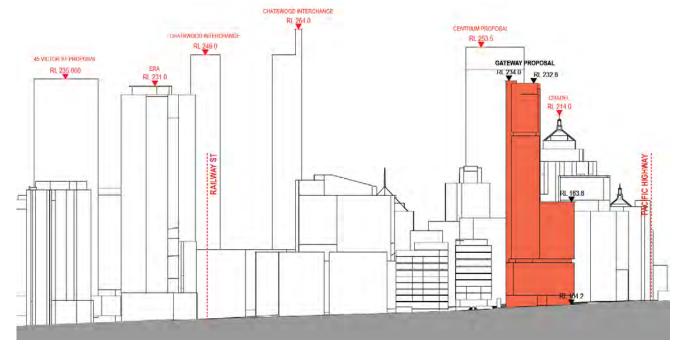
Scale of proposed tower relative to existing and proposed towers in Chatswood CBD (Source: Architectural Design Report, FJMT)
